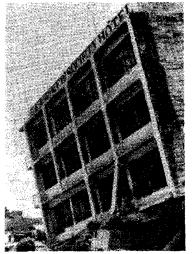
An example from the 1976 Mindanao Philippines earthquake of a building located on a corner lot. The New Society Hotel had two sides of rigid shear walls and two framed sides of greater flexibility. The amount of torsional movement accompanying ground story collapse is readily apparent.
